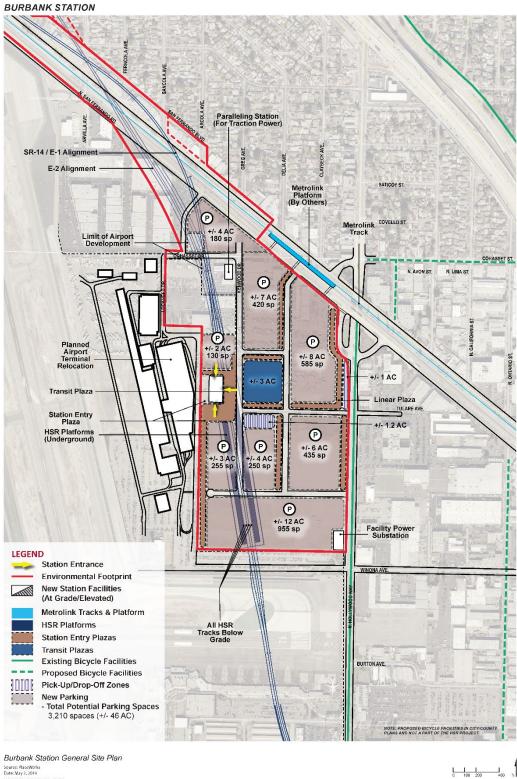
B-6 Palmdale to Burbank Project Section Build Alternatives and Station
